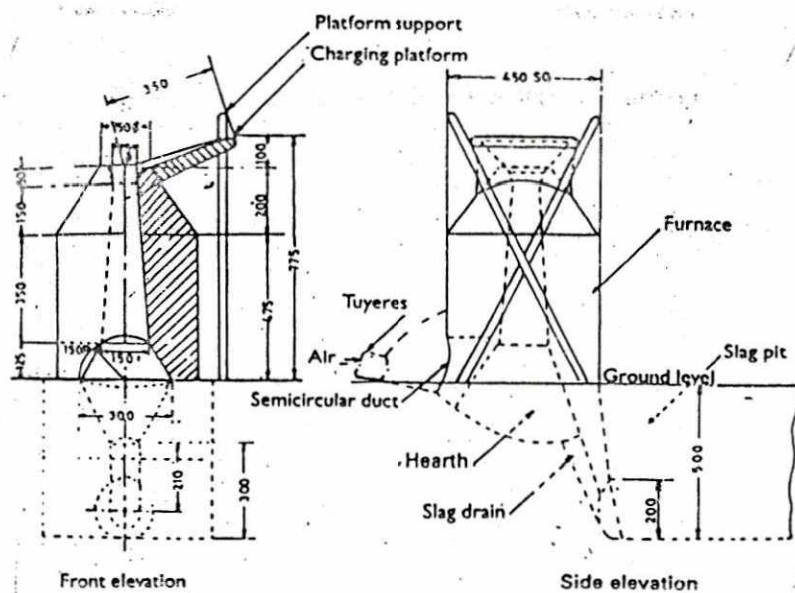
Cross-sectional drawing of Jiragora furnace.
